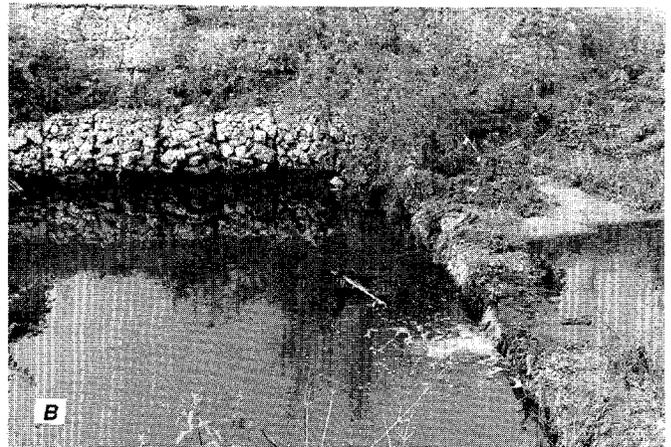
Moores Run at site 46. A, View upstream of stilling basin downstream from culvert. B, Apparent undercutting of gabion at toe of side slope, on stilling pool downstream from twin bridges. Note rock-and-wire mattress in background.
